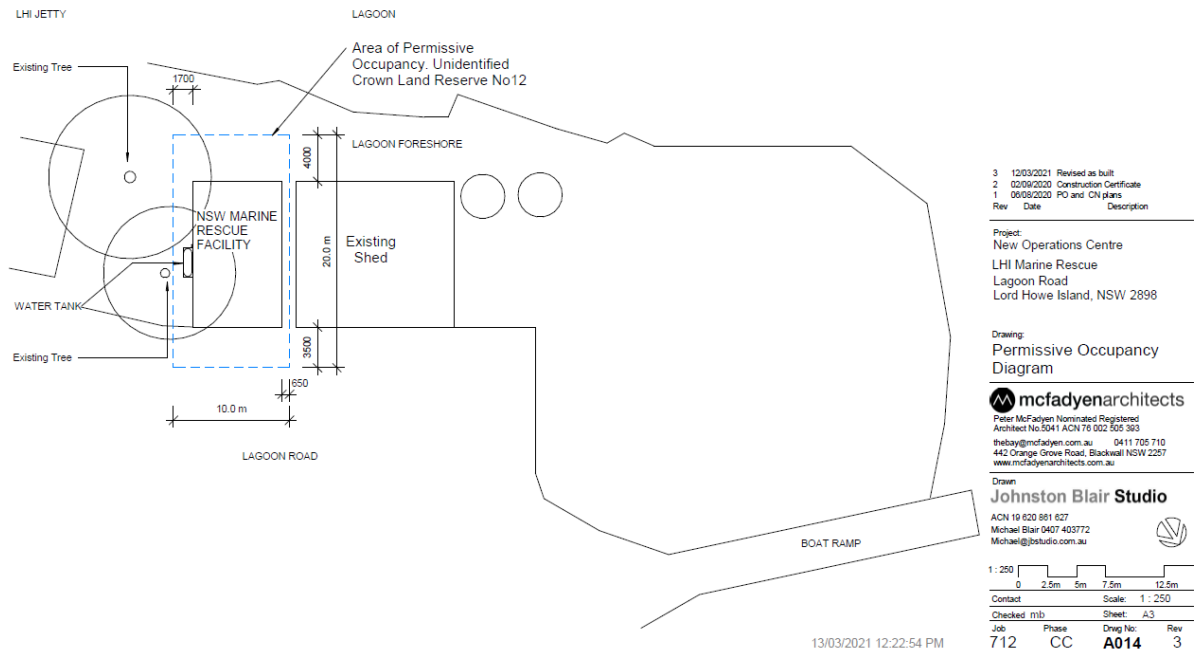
Plan view detailing Permissive Occupancy area outlined in blue.
